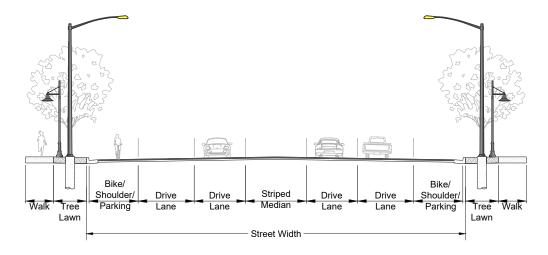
Typical Arterial with Continuous Street Lighting and Non-Continuous Pedestrian Lighting Cross Section
